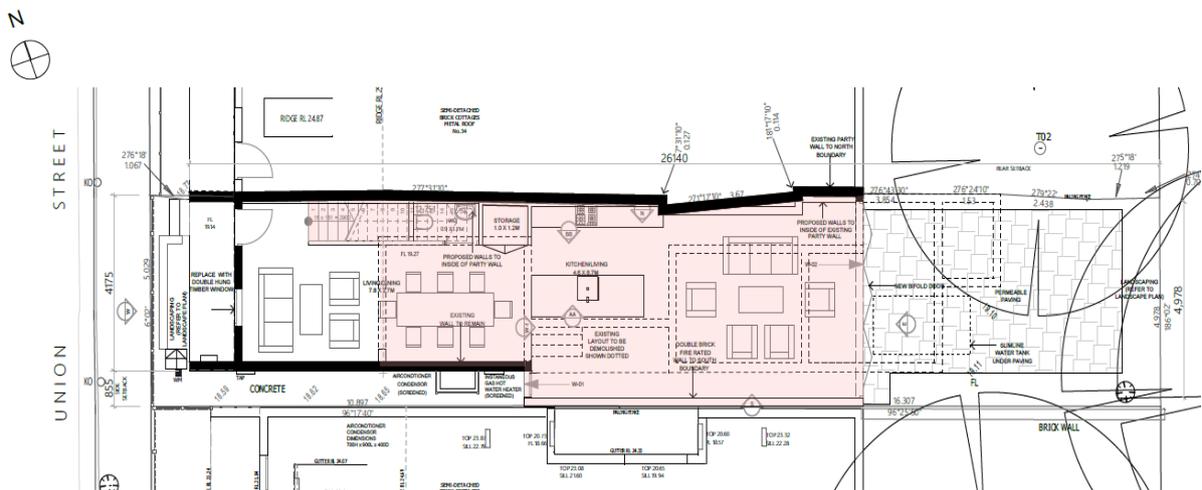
Proposed Ground Floor Level (extent of new works outlined in red)
